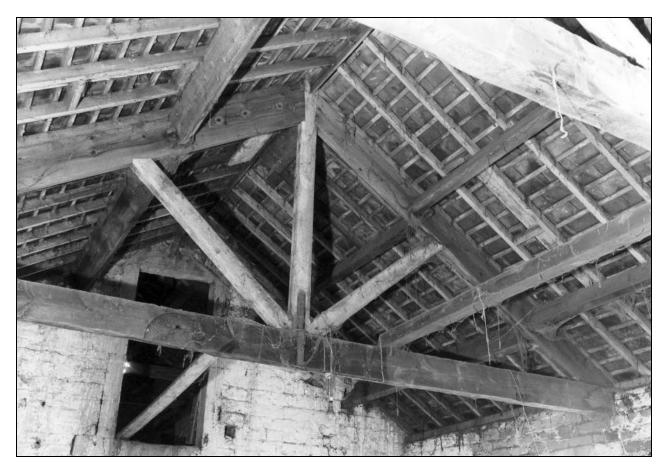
Building 1b: roof truss, from the south-west (film 4, frame 7)
